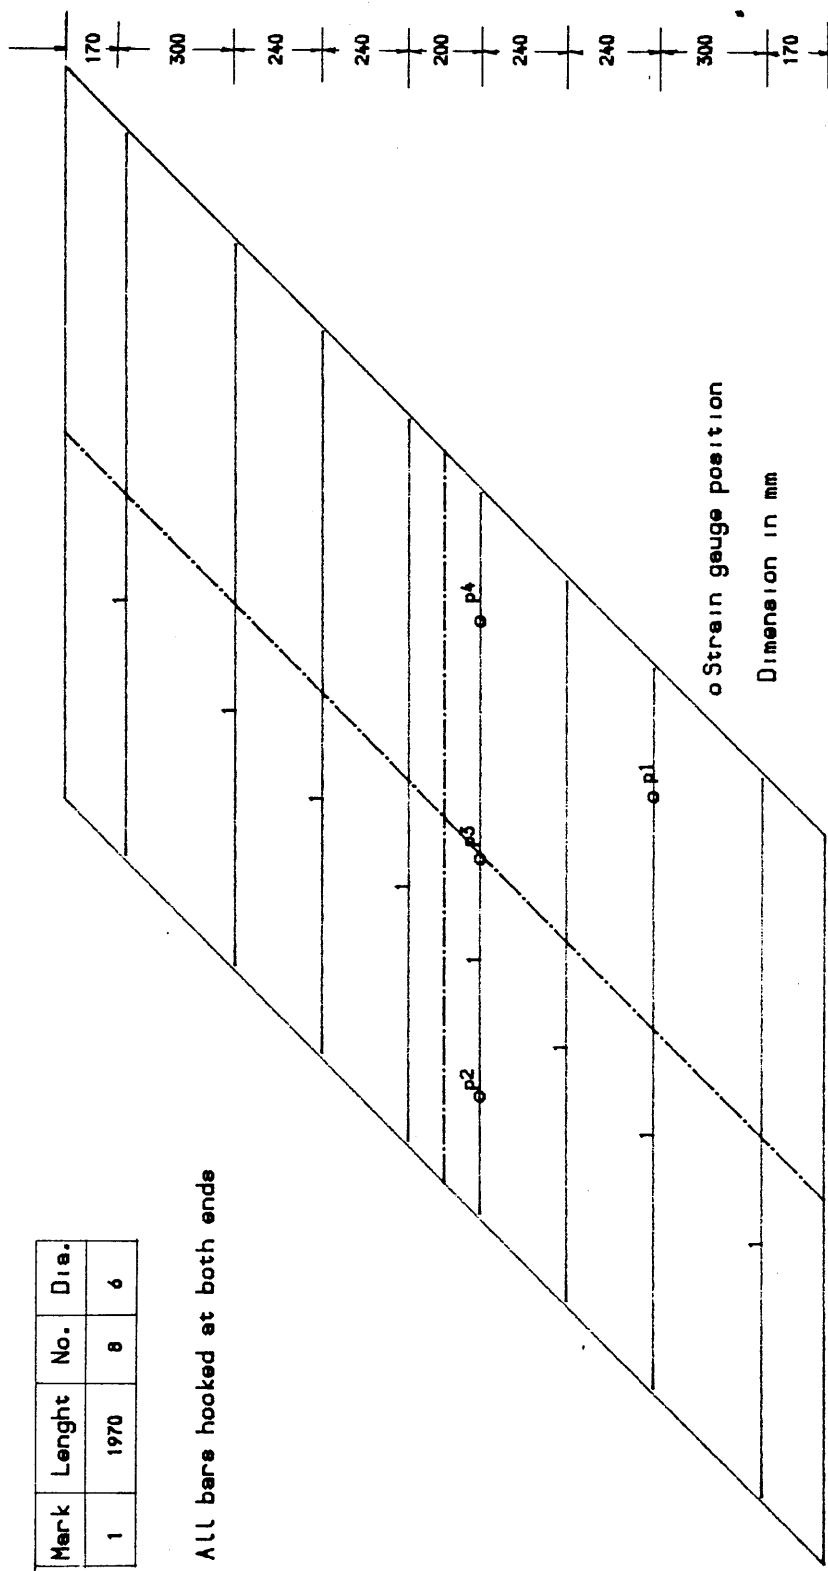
MODEL SKEW SLAB NO. (4) Details of bottom and top transverse steel parallel to the supported edge and position of bottom strain gauges
